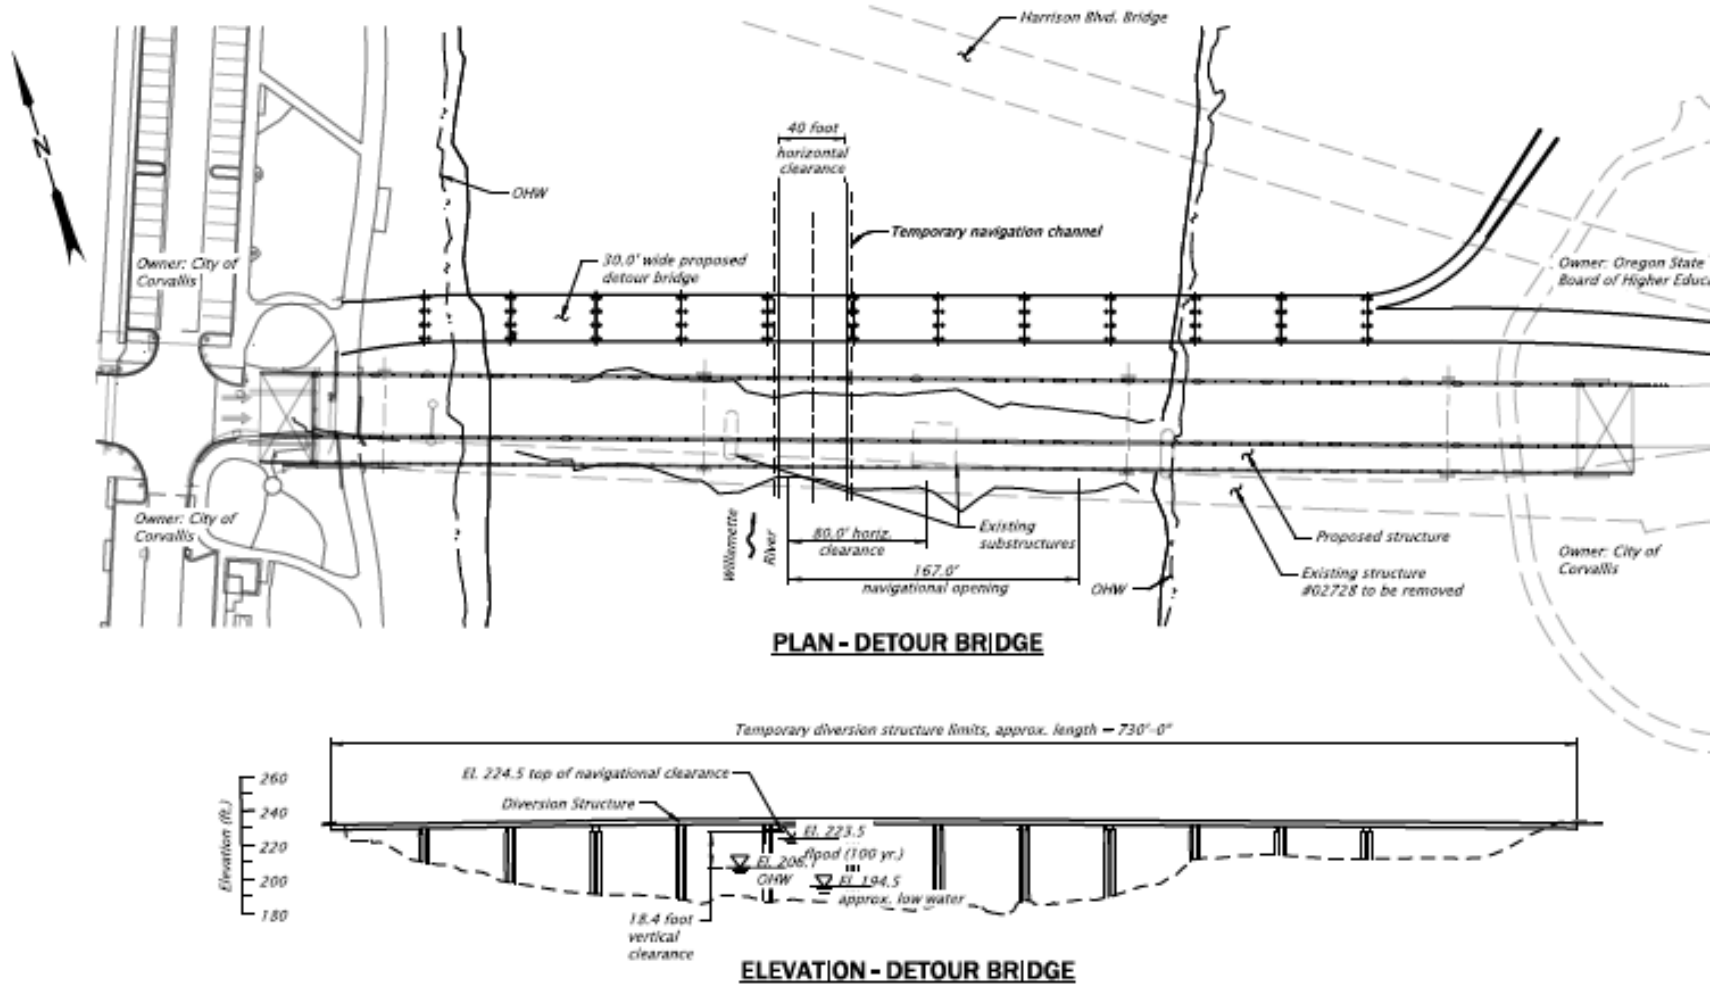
Plan and Elevation View of Proposed Temporary Detour Bridge
